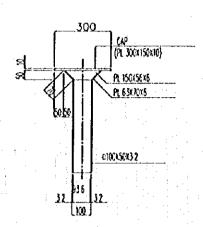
# DETAIL OF DRAINAGE SCALE 1/20 WITH SIDEWALK
